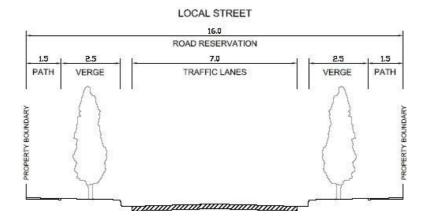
(g) Port Sorell and Environs Street Cross-section designs - Local street
